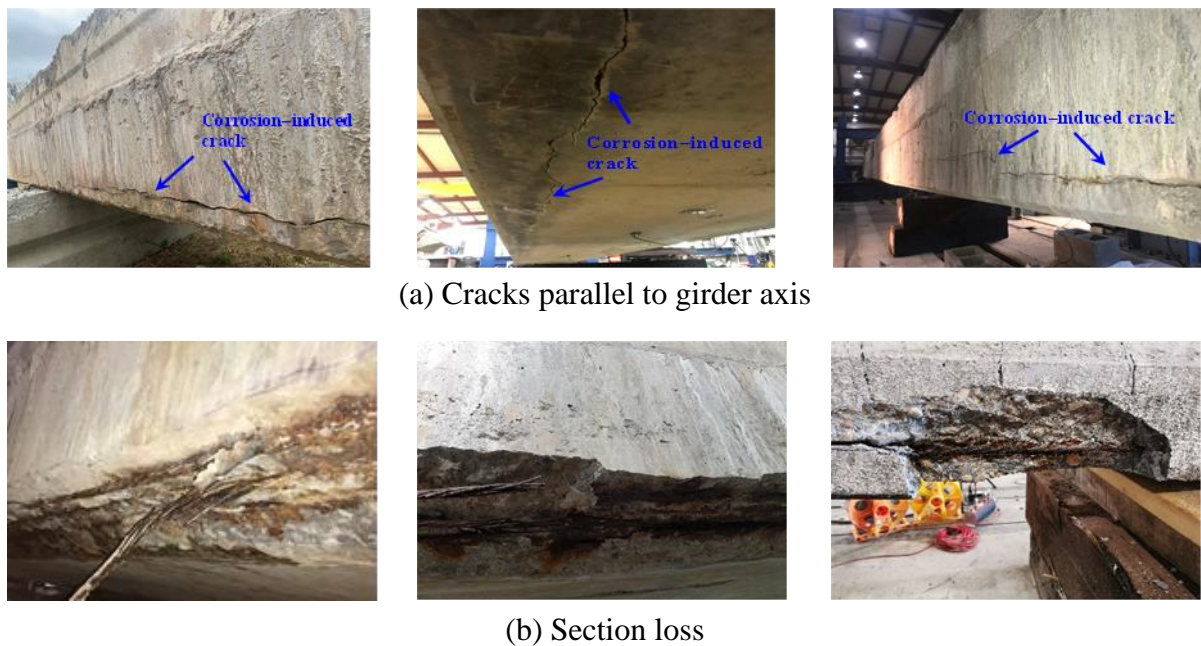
Examples of visually observed corrosion damage for tested girders
